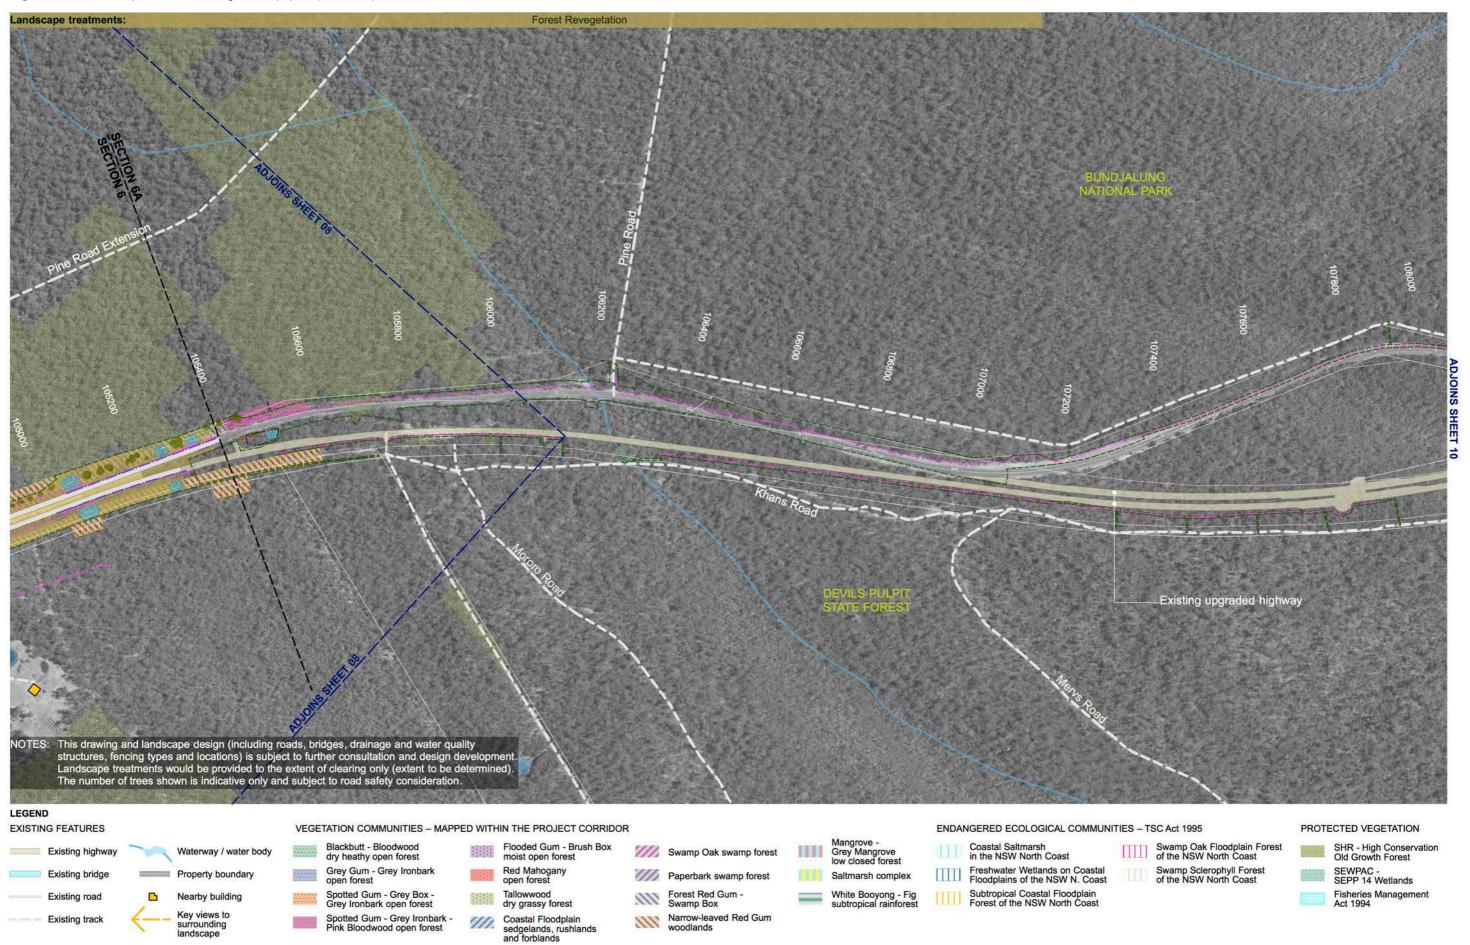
Landscape and urban design concept plan (10 sheets)
